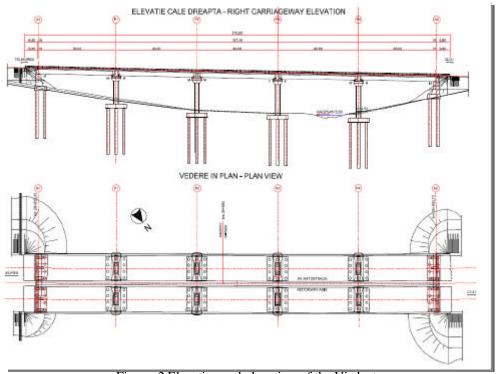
Elevation and plan view of the Viaduct; Romanian highway A3 - KM 29+602,75? KM 29+801,25
